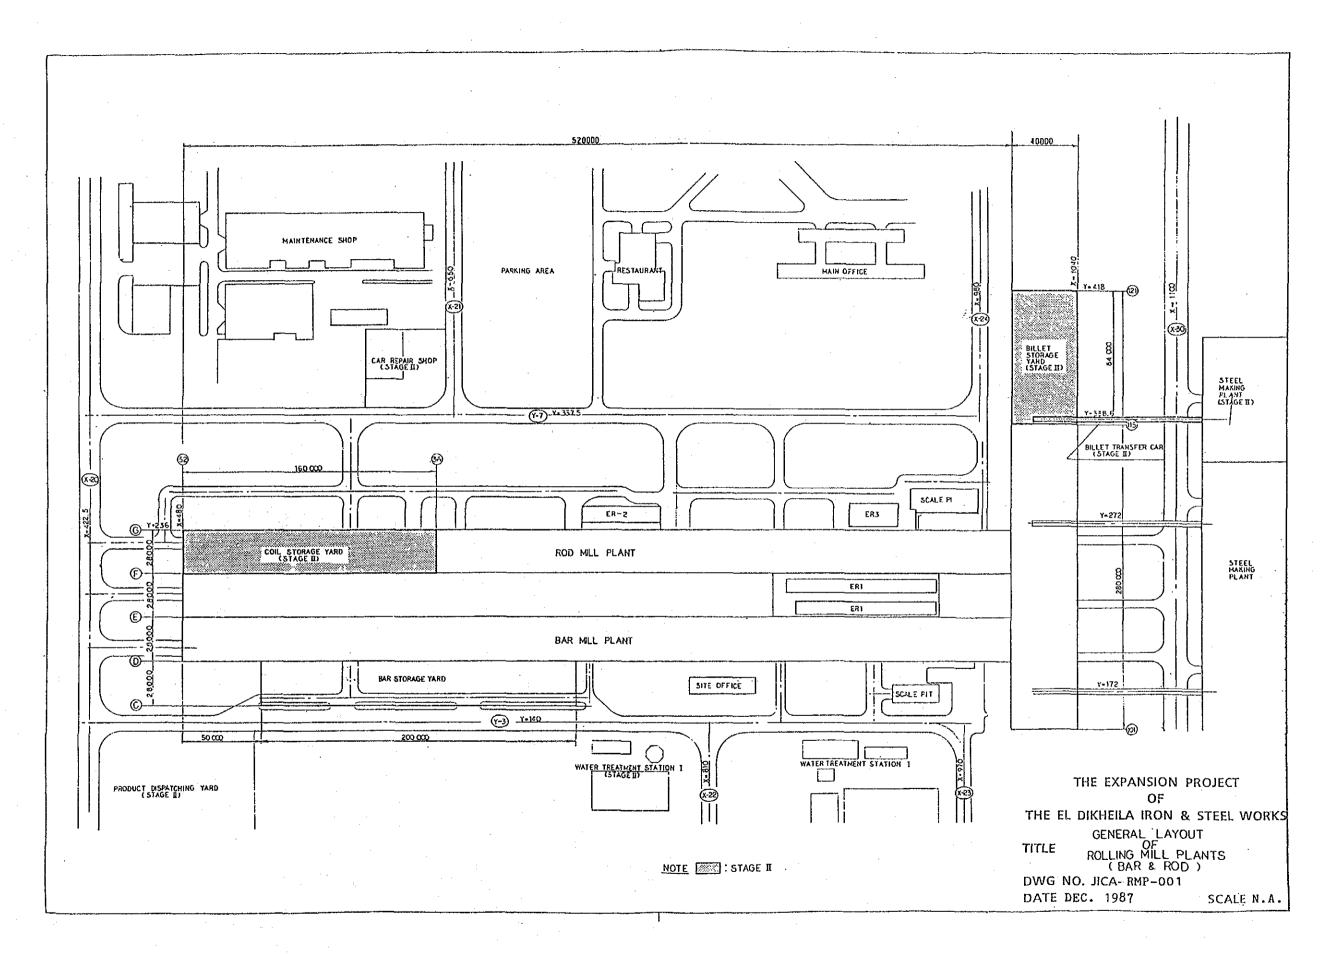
Drawing JICA RMP-001 and 002 show the layout of after expansion. RMP-001 shows the relation between Steelmaking plant and Rolling mill plant. RMP-002 shows the detail of rod mill layout.
